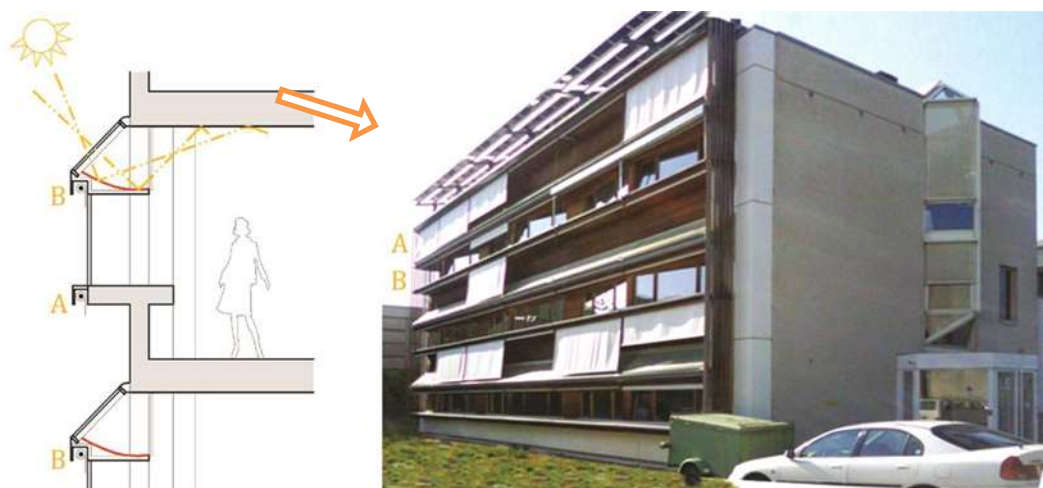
Anidolic daylighting system (ADS). Installed at LESO-PB, EPFL, Switzerland. The section of the anidolic façade with the two lines of horizontal windows – lower standard window provides the view, upper window with ADS helps to deliver the light deeper into the room (left); photo of the façade (right), arrow indicates the testing room in the third floor.
